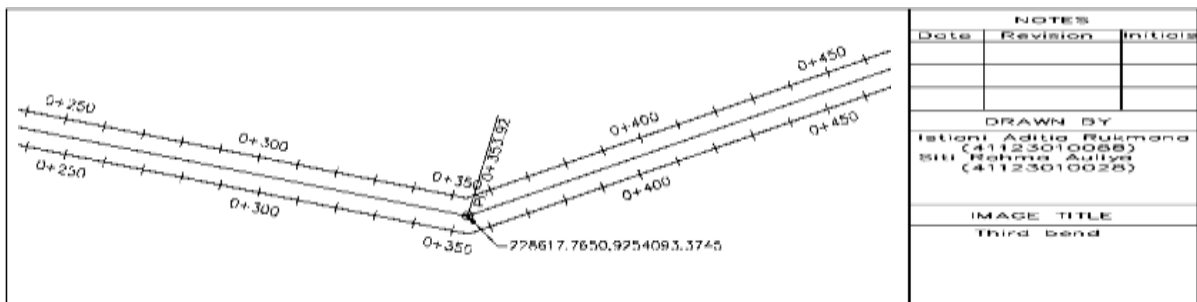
Coordination of Existing Alignment of Curve 3 (Elevation 1+950 to Elevation 2+300)
